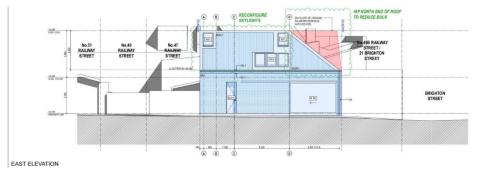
East elevation to laneway showing reduced bulk and scale of first floor addition (red area previously proposed has been removed) with hipped roof to north lowering overall scale and visual massing in views from the north and east. (Ref: DA page 10/32)
